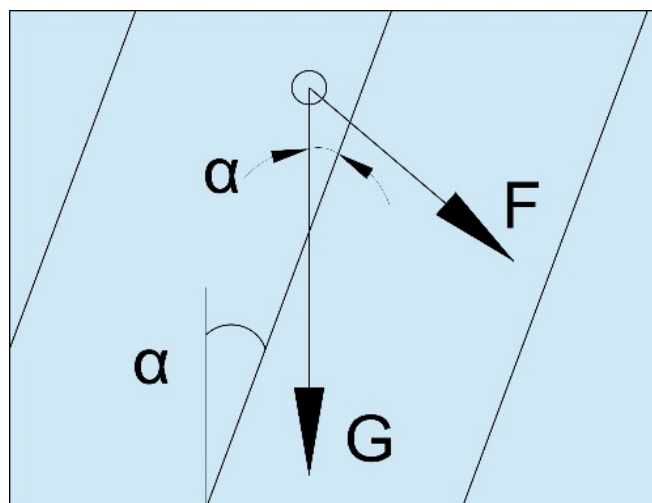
Scheme of the effect of overlying pile on the interlock connection with the underlying pile.
